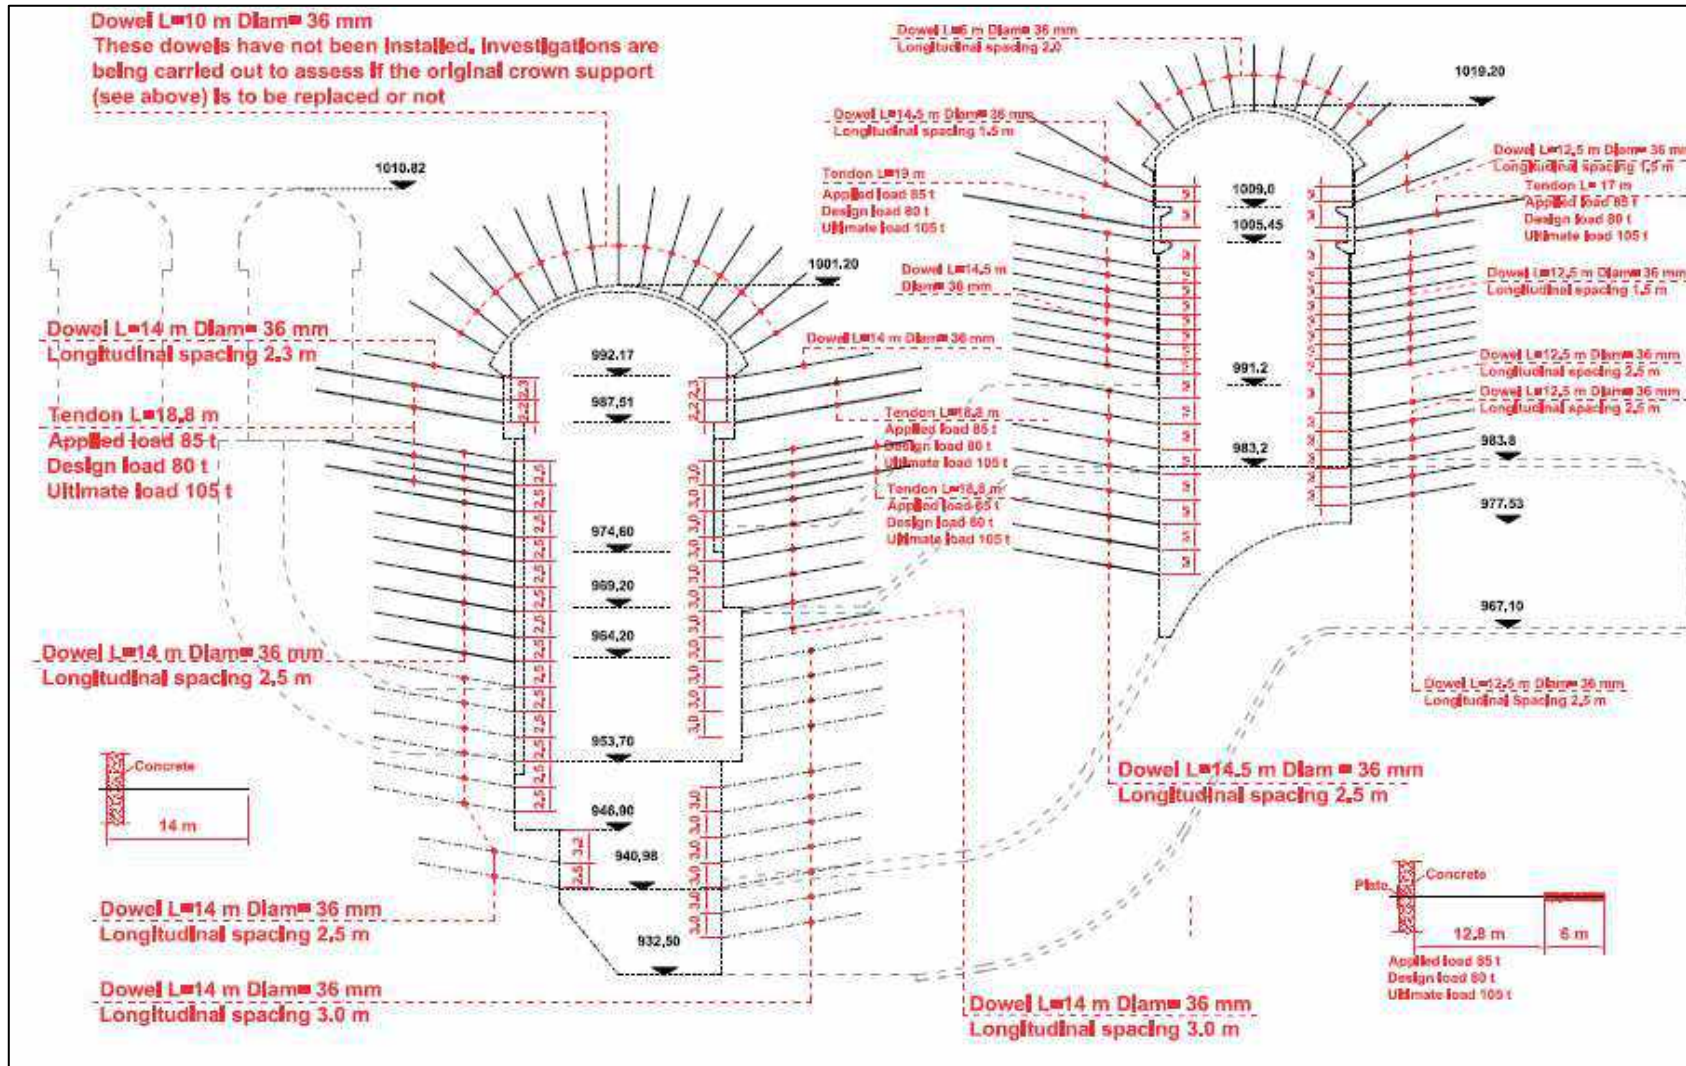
Replaced support system installed and to be installed in the MH and TH (see Drawing 1 for details)
